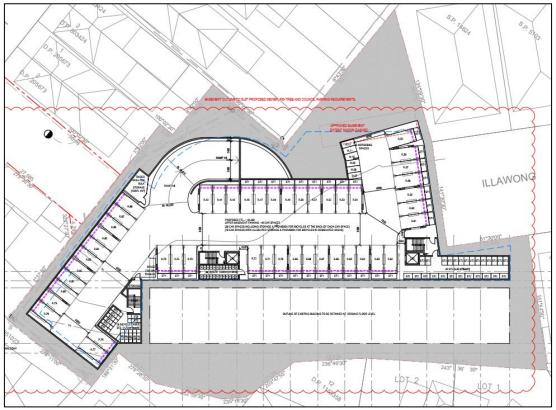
Extract of Approved Lower Basement (B2) Plan, DA-125/2012/A – 20 Illawong Avenue, Tamarama Source: Group GSA
